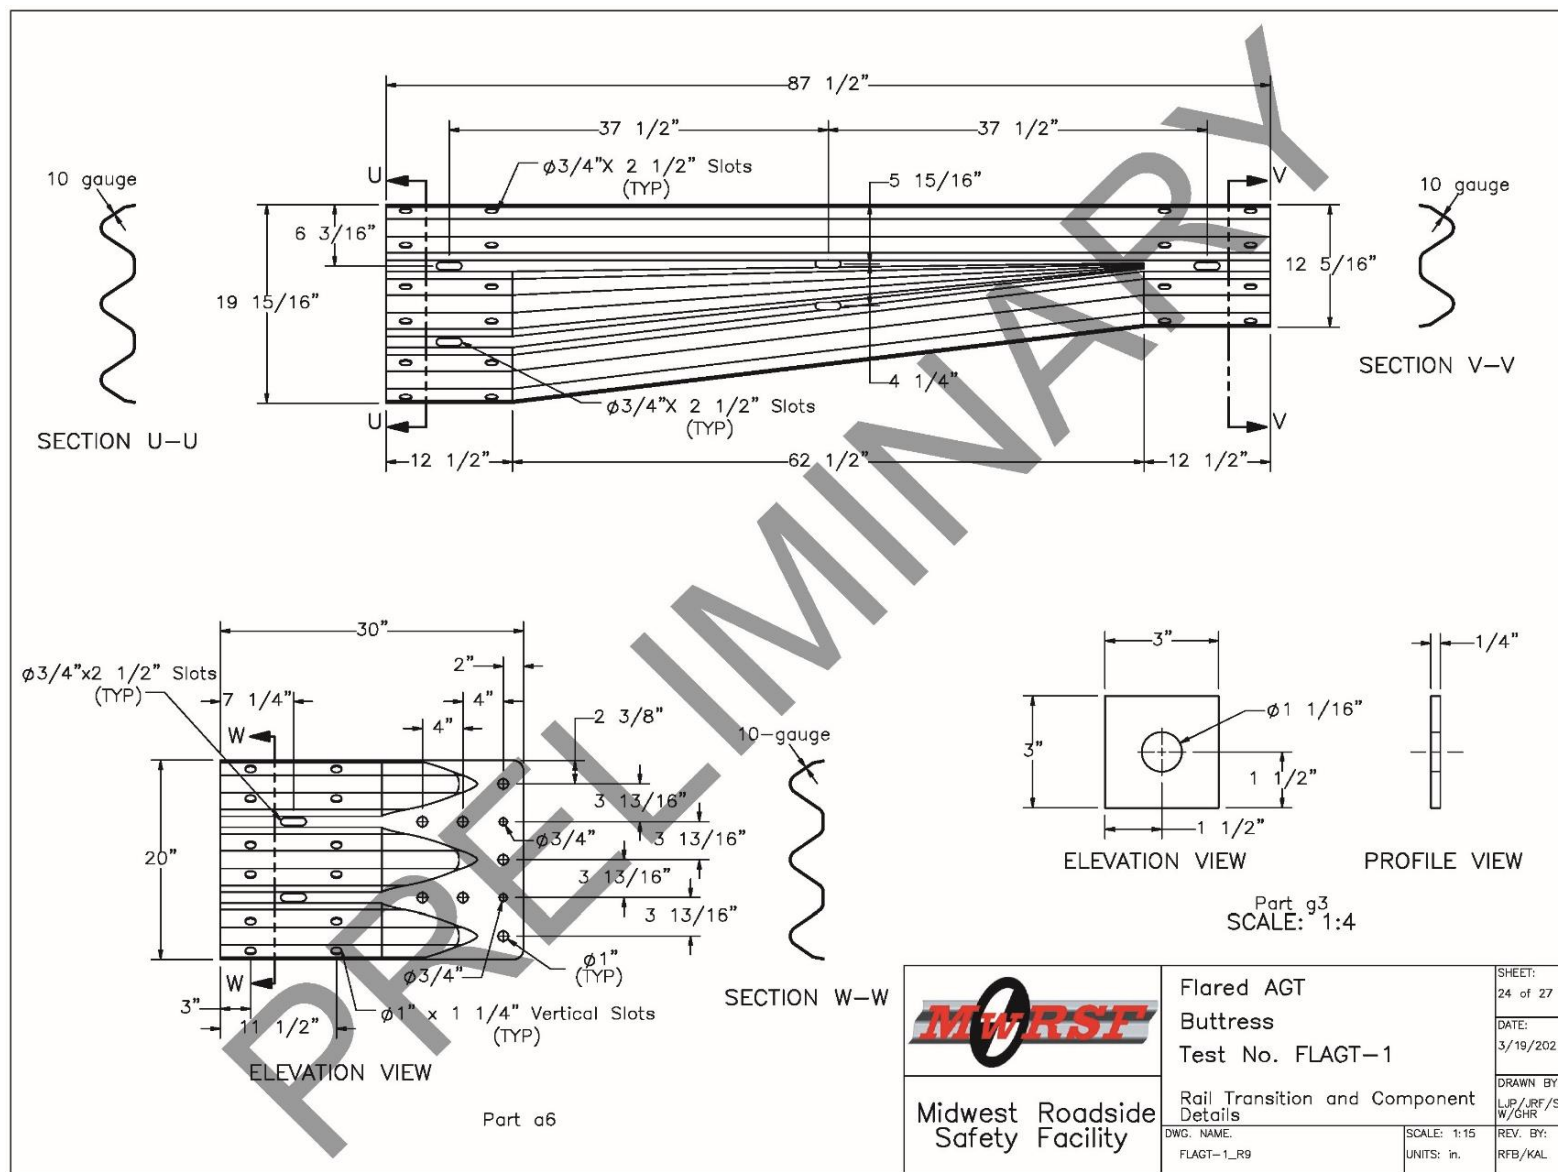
Rail Transition and Component Details, Test No. FLAGT-1
